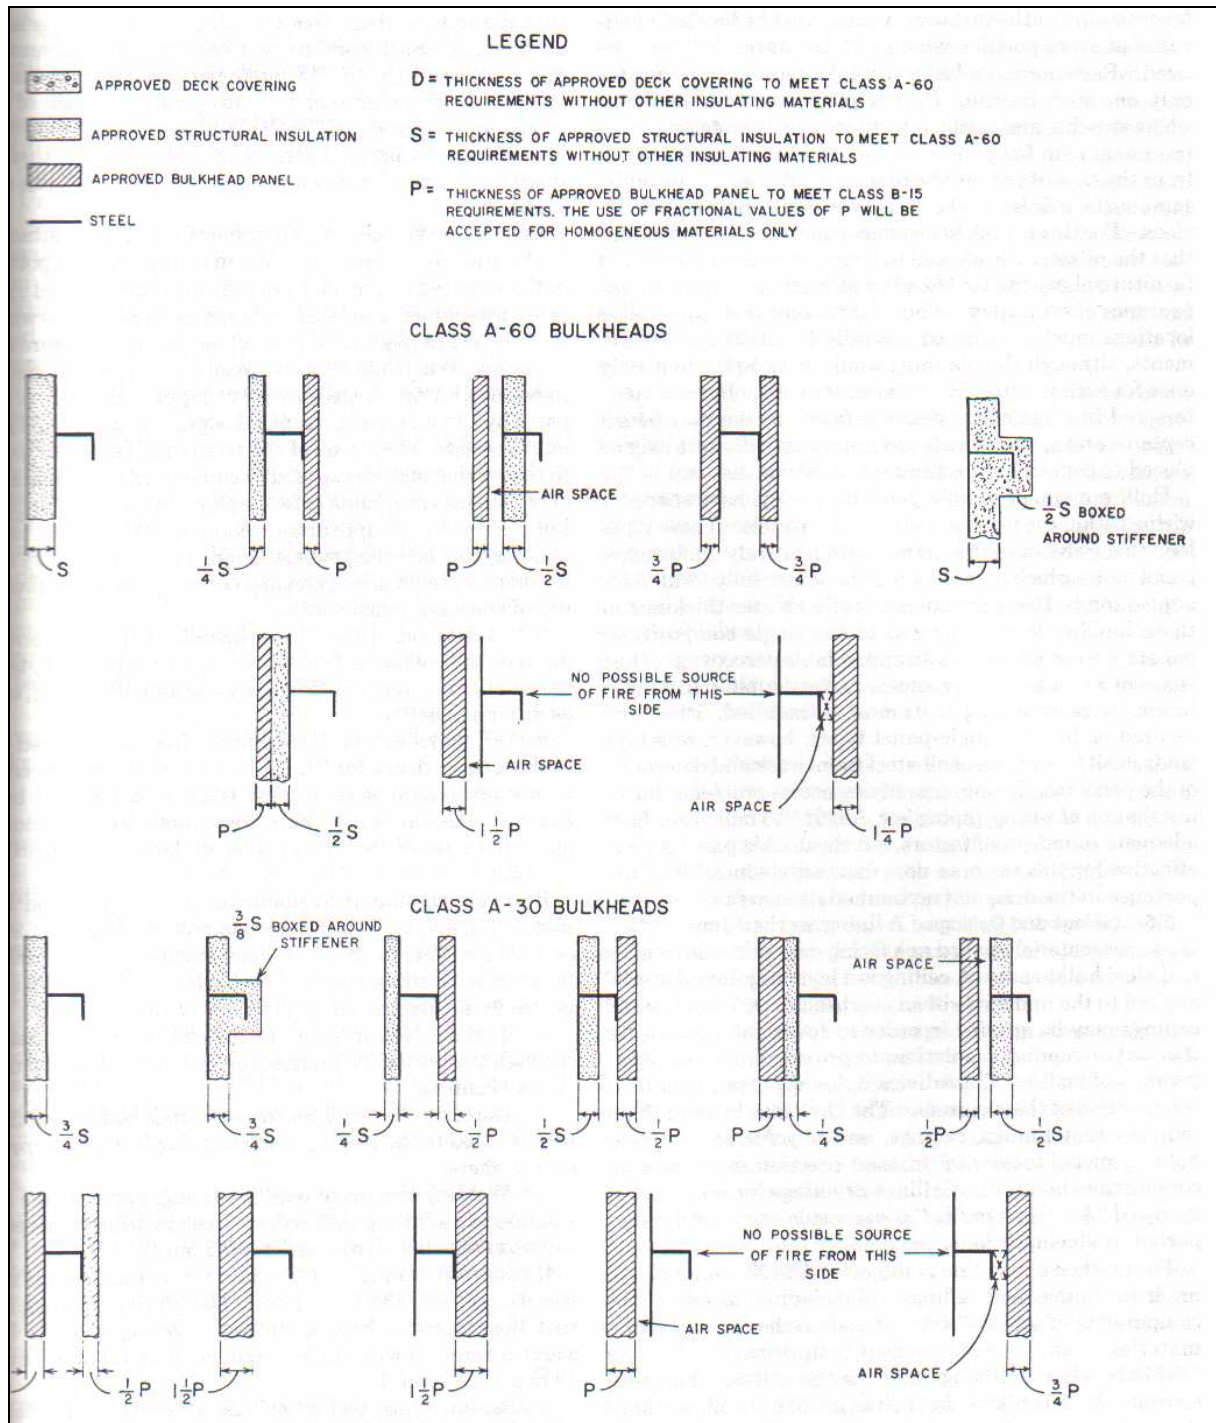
b – Application of insulation, linings, ceilings, and deck coverings to Class A fire divisions.
